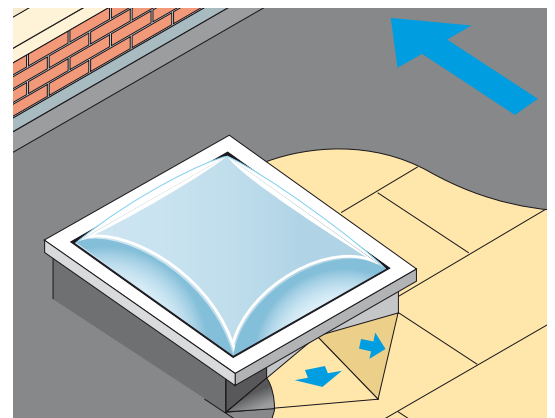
Use of Deflector Overlay Board where the roof fall is obstructed by rooflight
